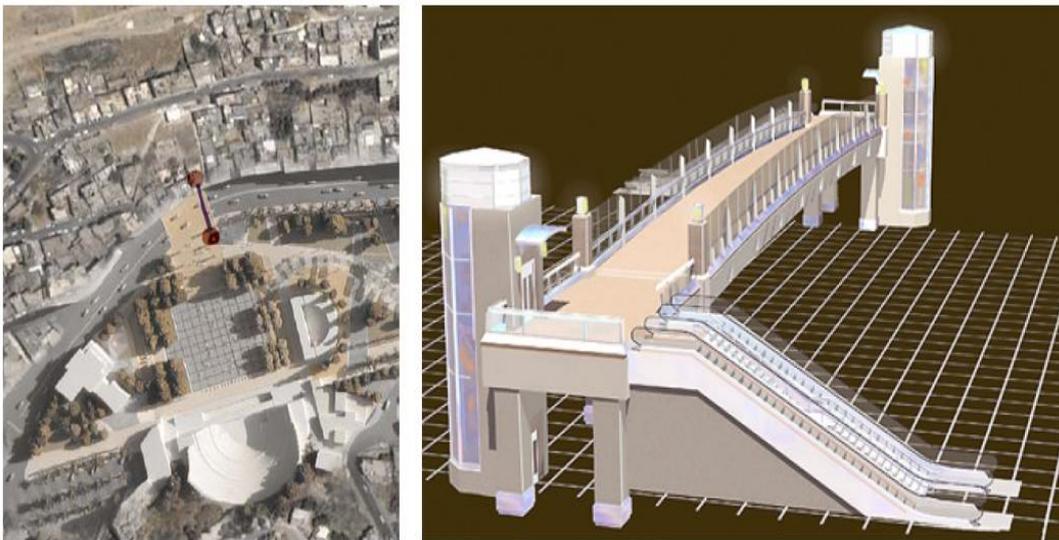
Proposed Pedestrian Bridge to Provide Accessibility
